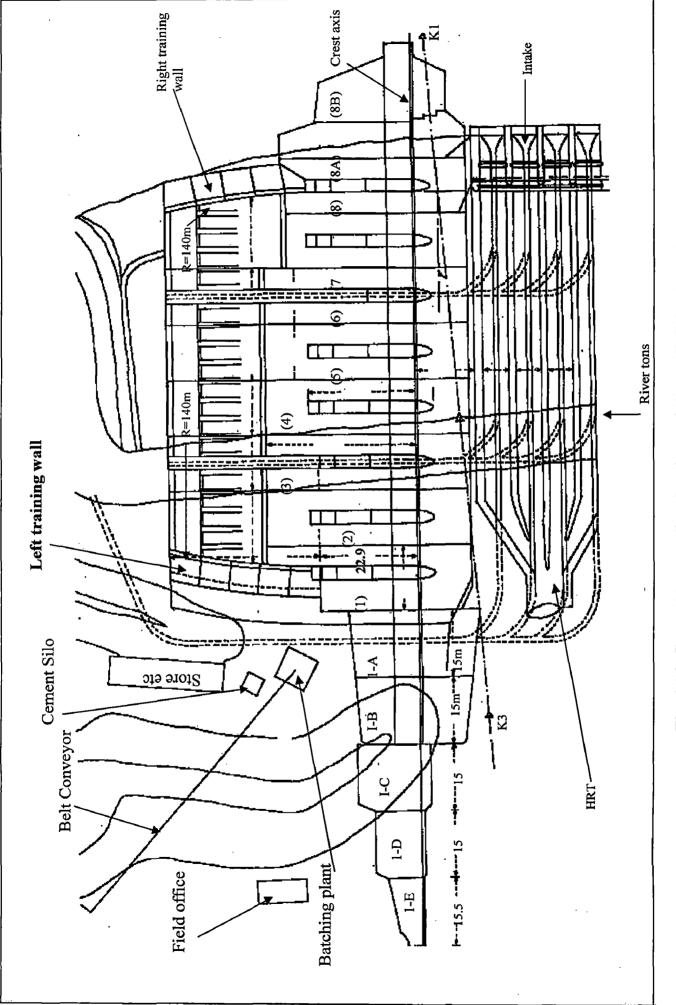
General layout plan showing training wall (Ichari Dam) 78
